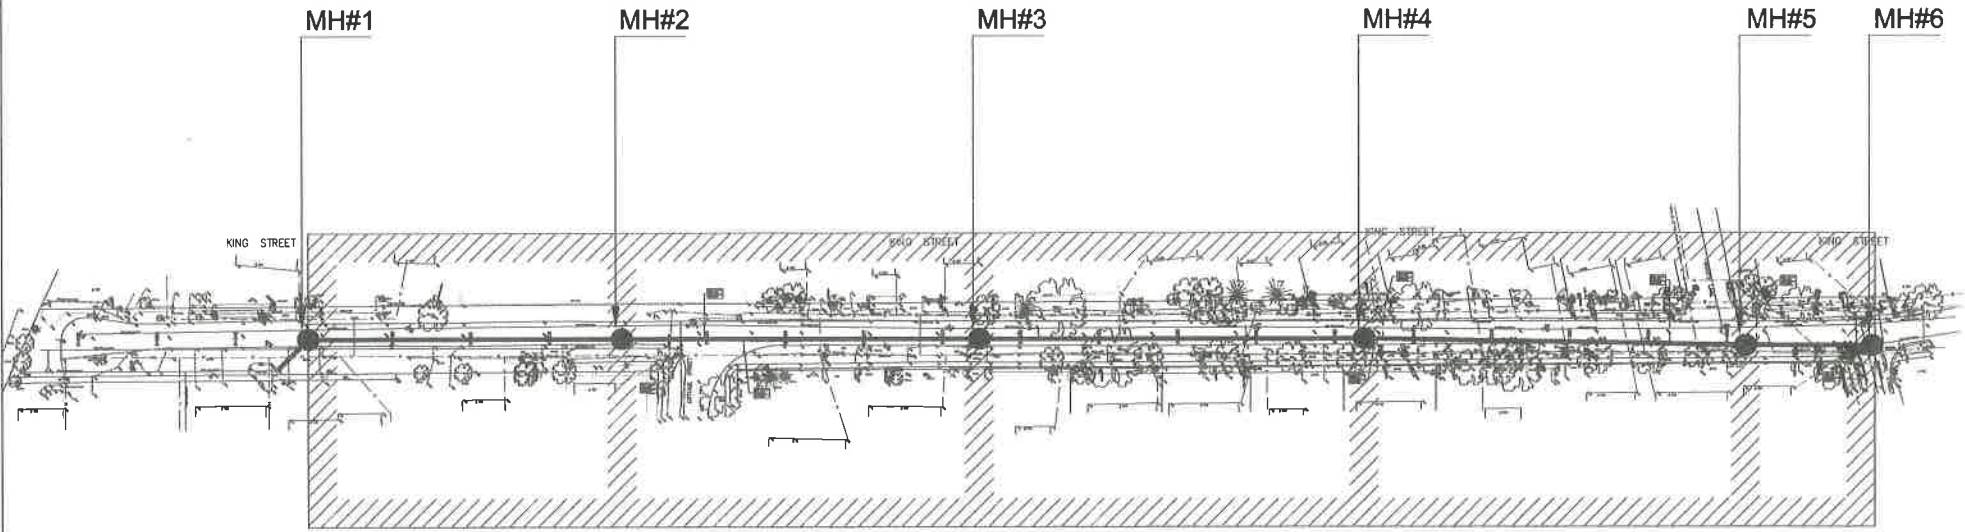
Proposed Storm Drainage Area Plan (5 Year Storm Event)
